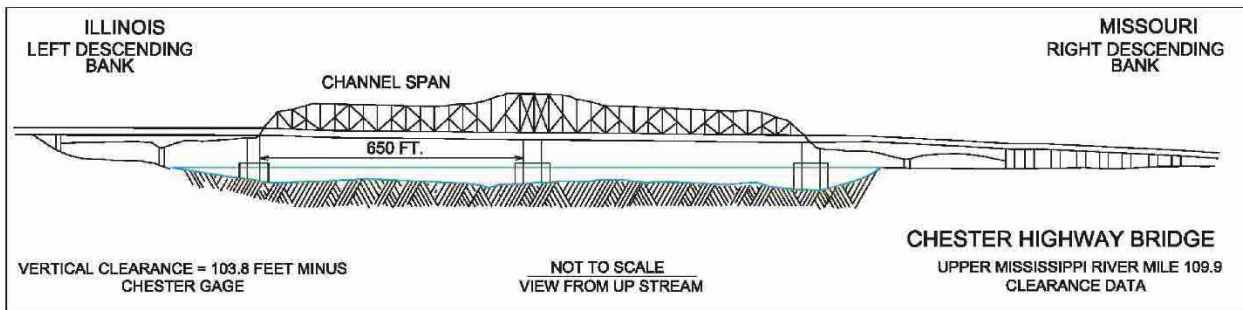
Potential Bridge Types and Existing Bridge Configuration
